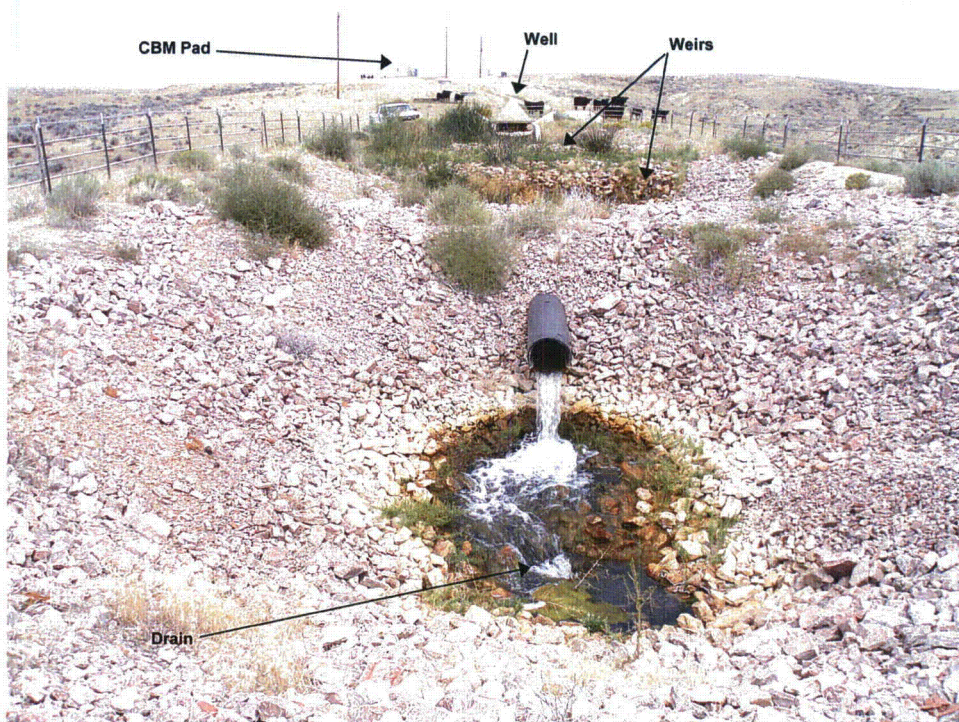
Site 1, Cottonwood Creek Drainage, Non-wetland.
